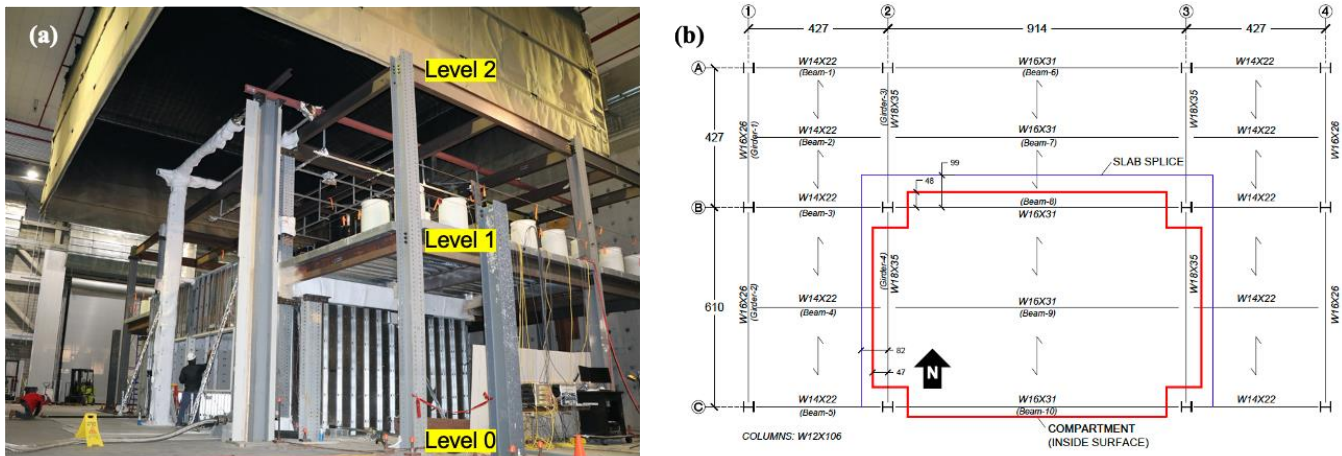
(a) Two-story prototype steel framed building; (b) Floor plan view (dimensions in cm).
